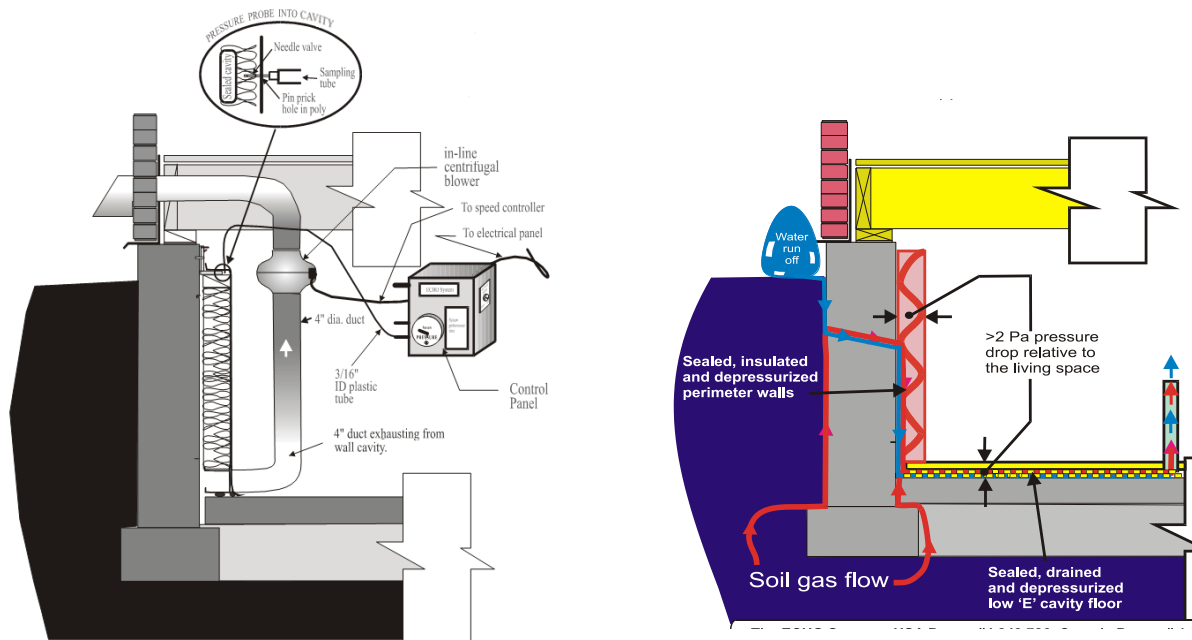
Depressurized (a) insulated wall with blower and control panel; (b) insulated wall and Low E floor with leaking cracked foundation wall.
